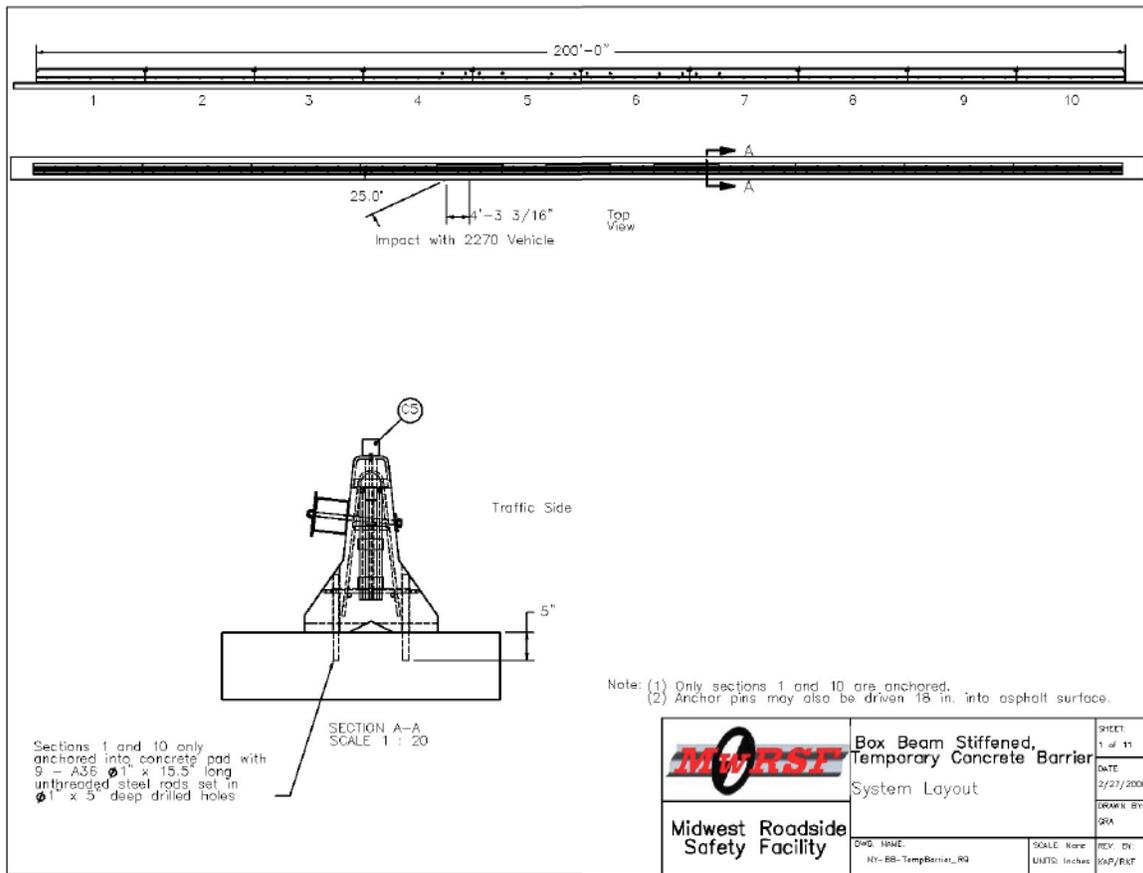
Stiffened Temporary Concrete Barrier System Layout (English), Test NYTCB-1
